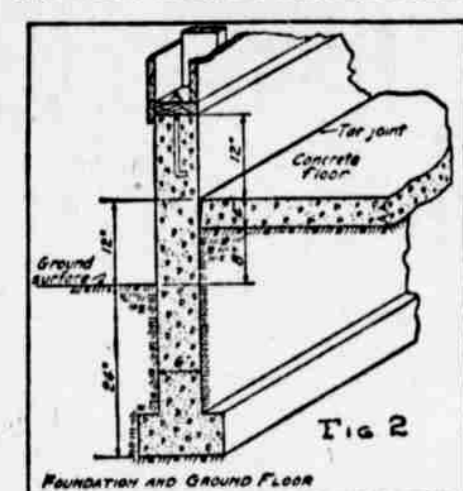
Showing a Good Method of Making Foundation and Floor of a New Building Ratproof.
